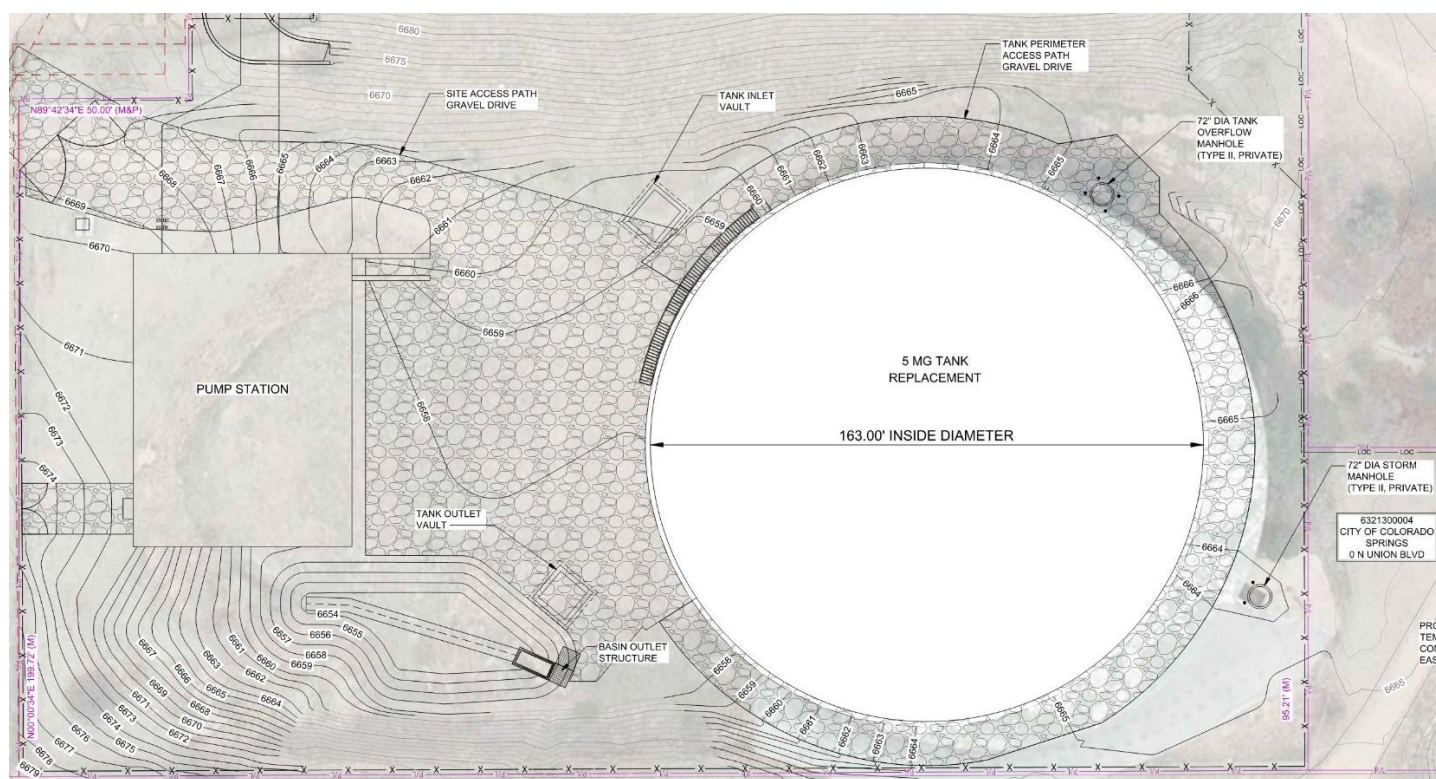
Enlarged Site Plan with Proposed Drainage Basin PCM, Outlet Structure, and Low-Flow Channel
